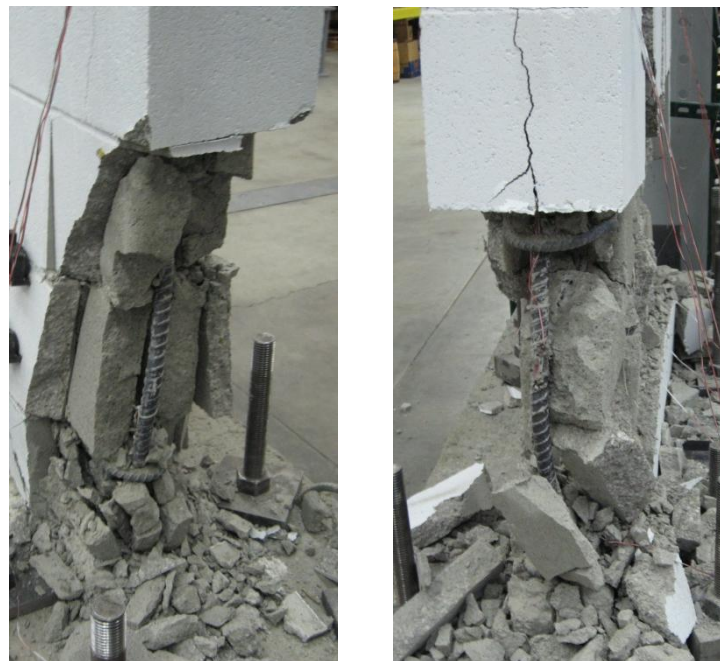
Wall C6: South Toe (Left) and North Toe (Right) at Test Completion
